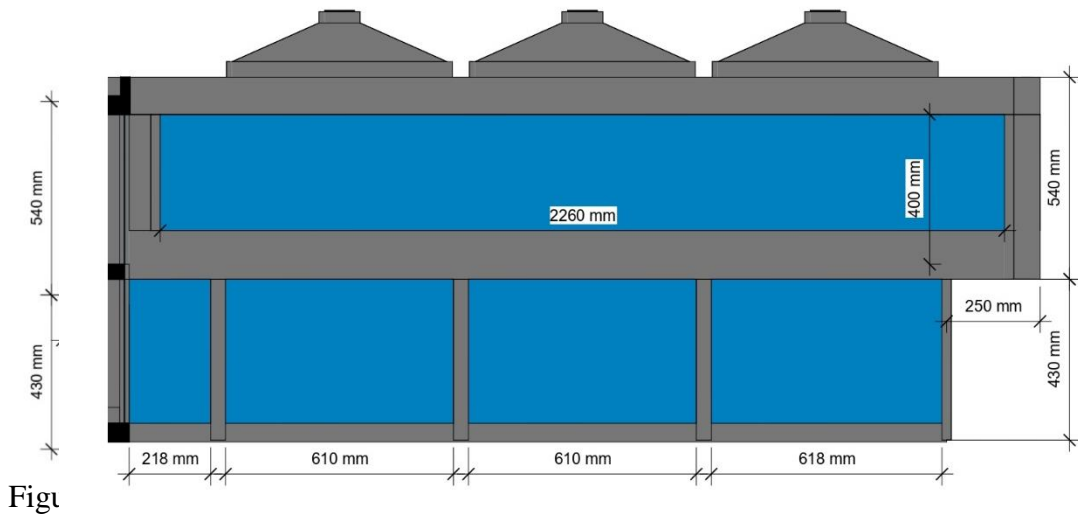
West facade drawing of the south section of METU Cafeteria Building
